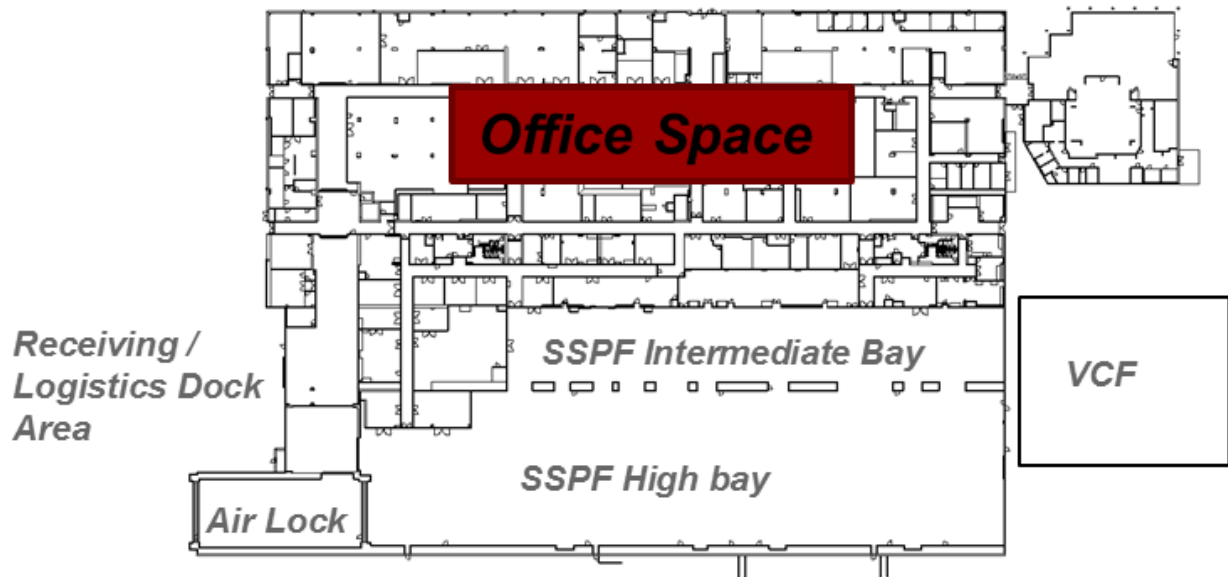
Space Station Processing Facility (SSPF) Floor Plan
